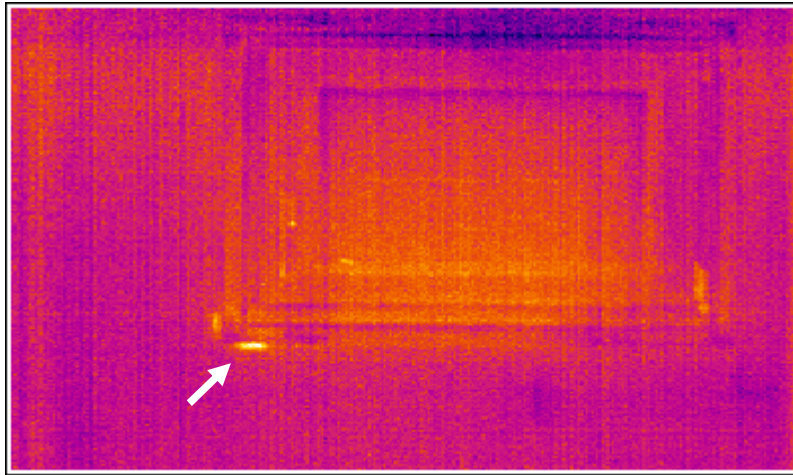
East Windows North Corner – Infrared (Rainbow)
